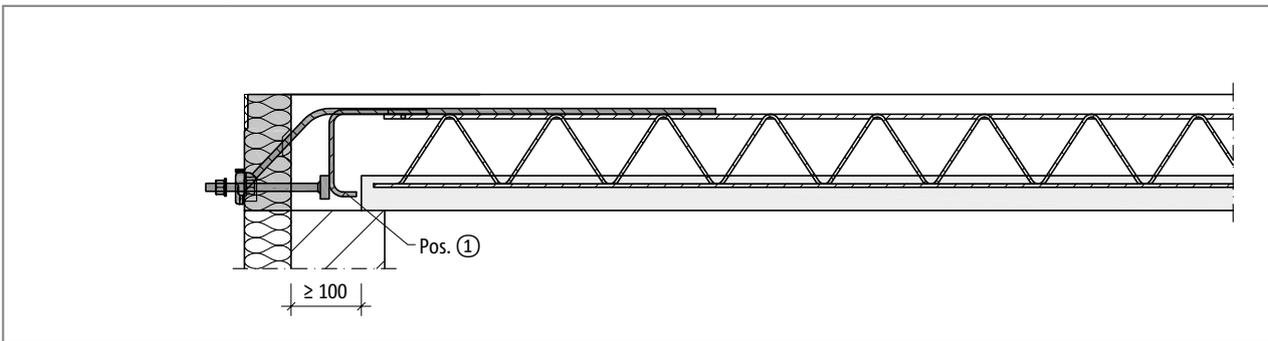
Schöck Isokorb® T type SQ: On-site reinforcement for semi-precast construction: Cross section
